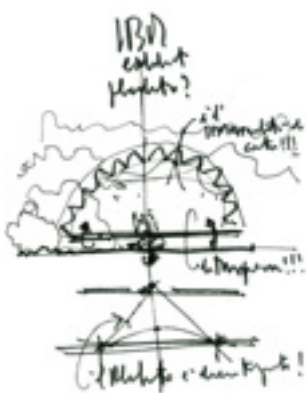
Sketch of the IBM Travelling Pavilion by Renzo Piano
